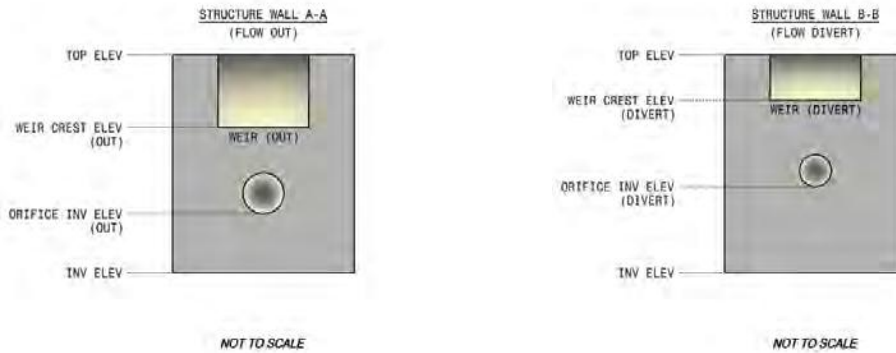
Stormdrain Diversion Structure Concept: Section Views for WDS # 2 and # 3
